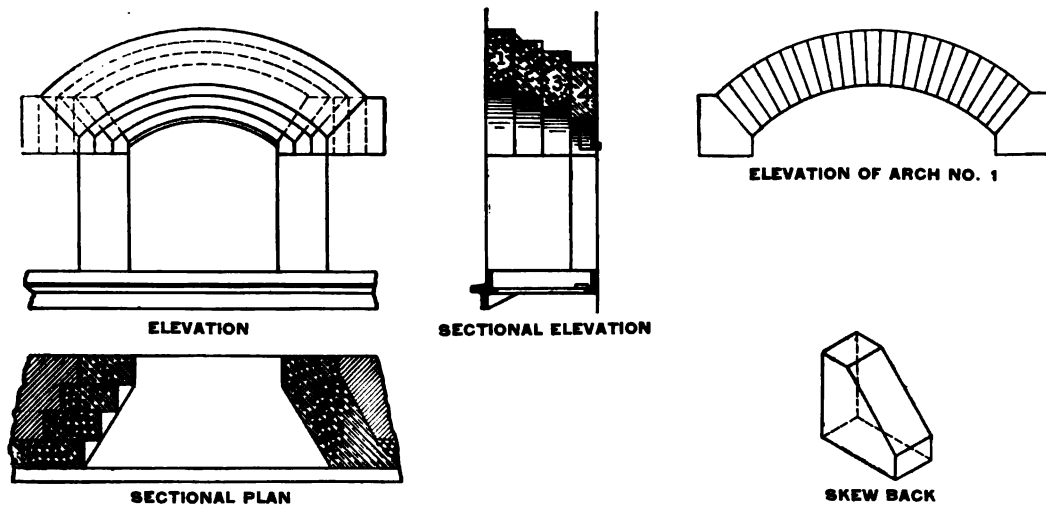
DETAILS OF FIRE DOOR ARCHES
